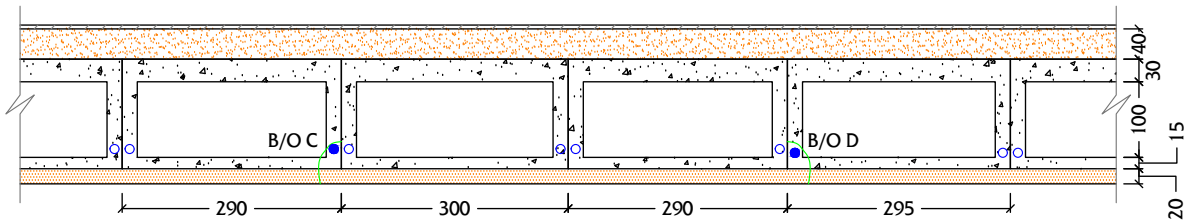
PART SECTION LOOKING EAST THROUGH ROOF SLAB SHOWING DETAILS OF PRECAST CONCRETE PLANK - SURVEY AREA RS3 SCALE 1:5
